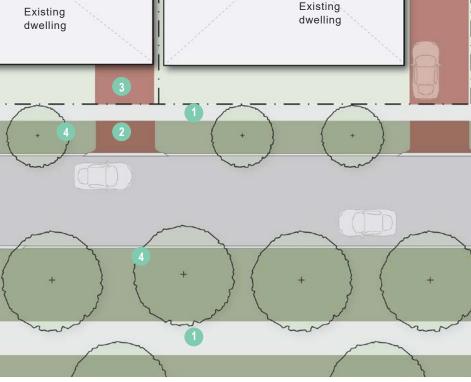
Typical Raceway Precinct streetscape illustrating proposed footpath and crossover materials.
